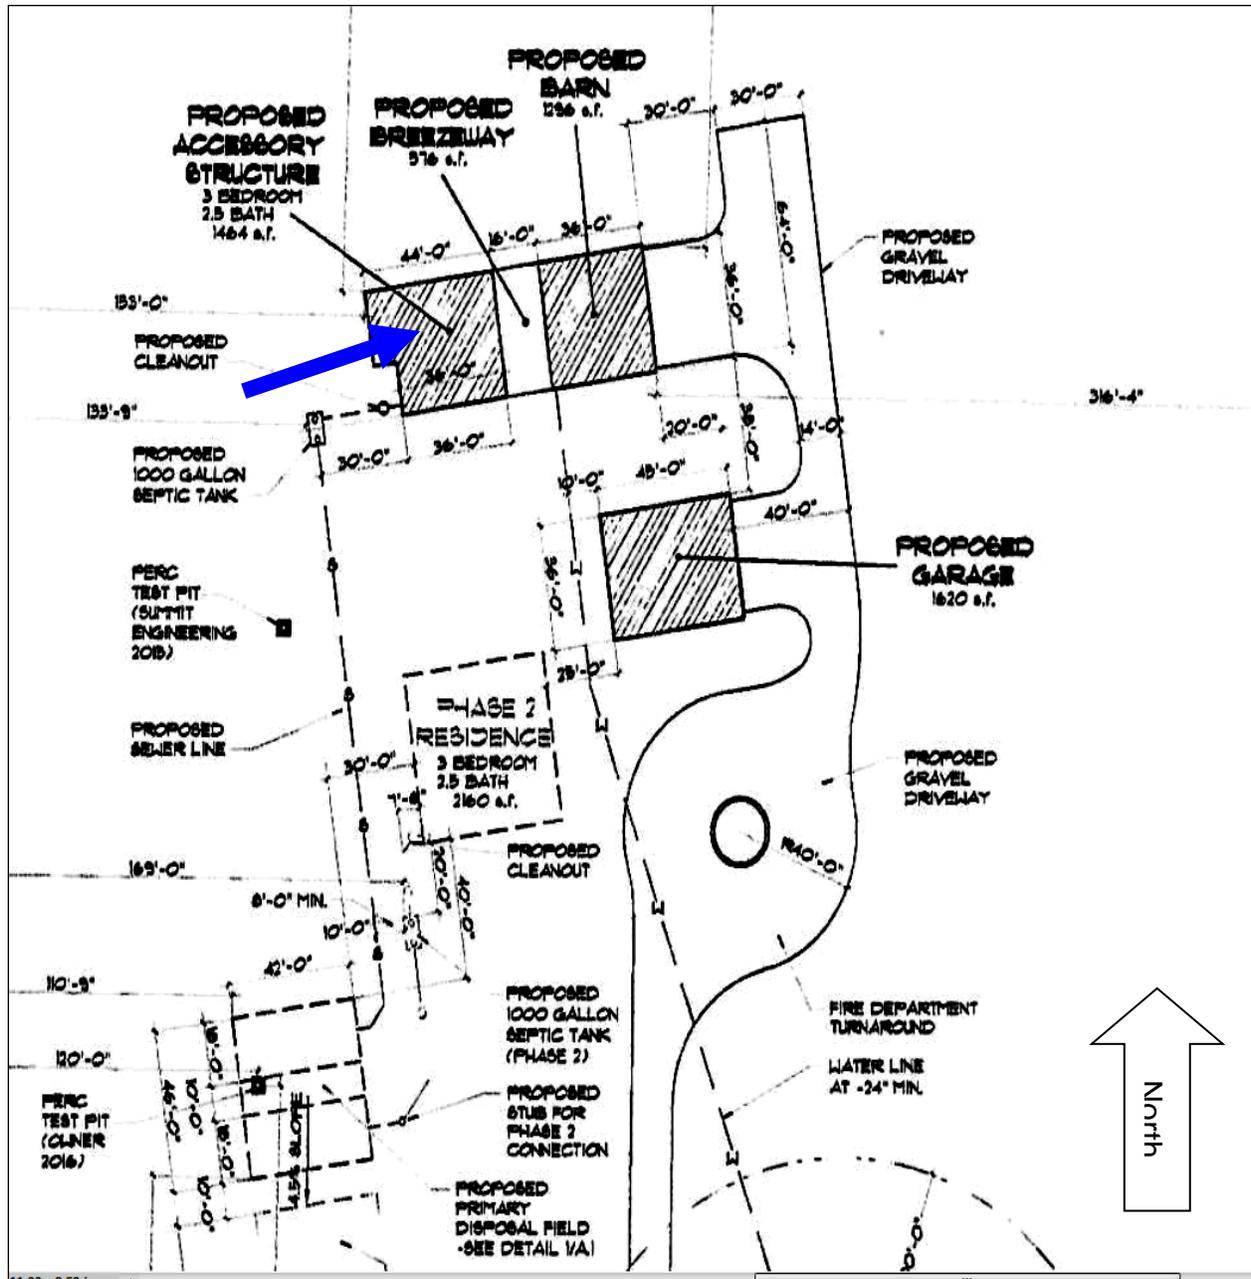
Plot Plan. The accessory dwelling is one of four buildings that will be placed on the subject property. The accessory dwelling may be attached to a non-living structure by a breezeway. The cumulative square-feet of all proposed accessory buildings is below the maximum 5,000 square-foot allowance for accessory structures in the Estate zone (see Section 2.3).
